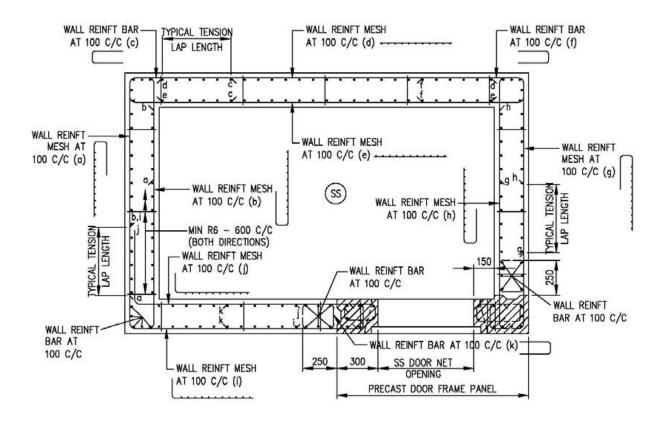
(e) DETAILS AND SECTIONS OF PRECAST SS DOOR FRAME WITH VENTILATION SLEEVE ALONG ITS SIDE (TYPE 1)
